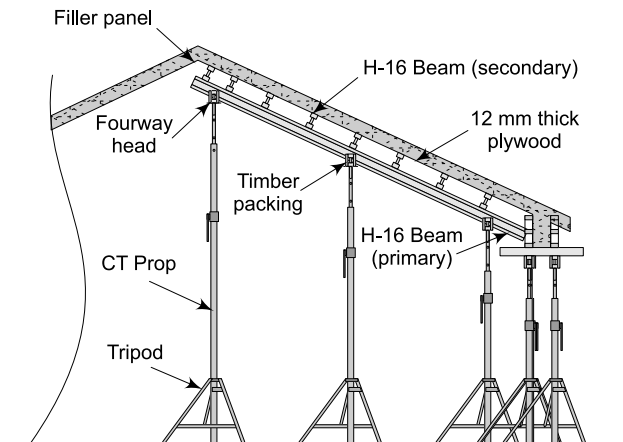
Typical Arrangement of L&T Flex System for Inclined RC Floors.
